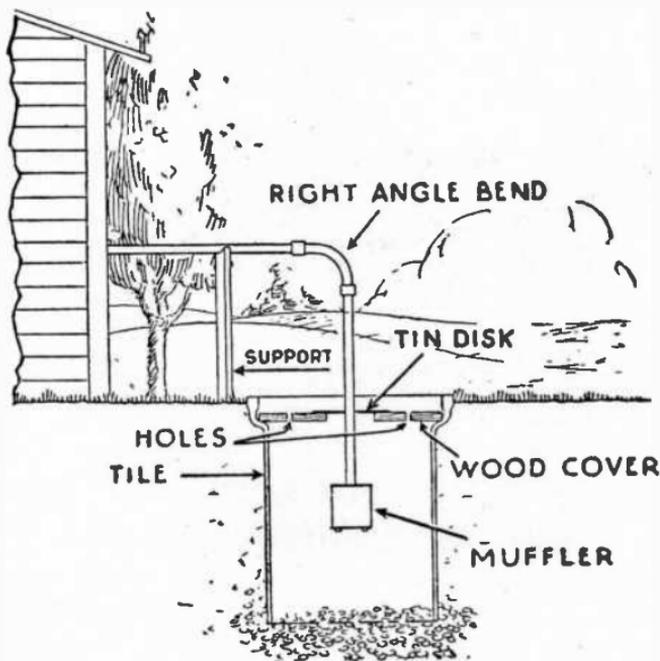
,776.—Muffled exhaust. Bury a two ft. sewer tile in the ground so that the top will project slightly above the surface. The bottom of the tile should be open to allow water to drain out. Two pieces of 1 in. pipe and a right angle bend should be used to run from the exhaust flange on the plant to the center of the tile approximately half way down. The muffler should then be fastened to the pipe in the tile. A wooden cover should be made to fit in the top part of the tile and a hole 7 ins. in diameter cut in the center of it. A tin disc should be nailed over this hole to prevent the wood becoming burnt. It will be necessary to drill several small holes in the top to allow the exhaust gases to escape from the tile. A concrete cover can also be used in place of wood. This should be made so that it can be easily removed should it be necessary to clean the muffler. A 1 in. pipe should be cast in the concrete to allow the exhaust gases to escape from the tile.
